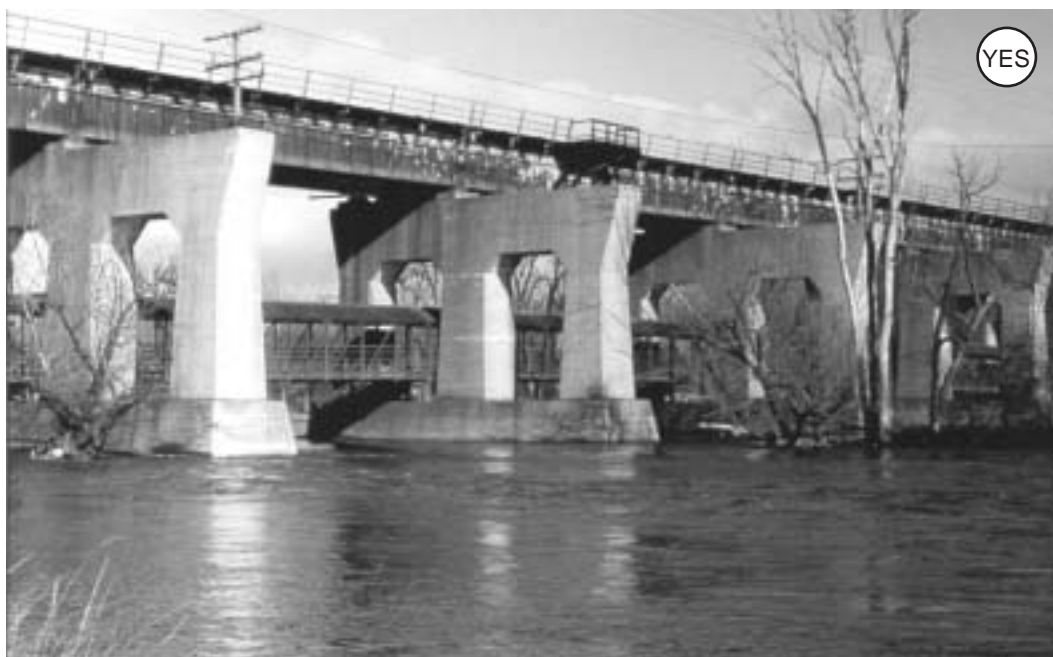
This path bridge spans a river under a rail-road bridge. Attention must be paid to flood water levels and the river's navigability.
